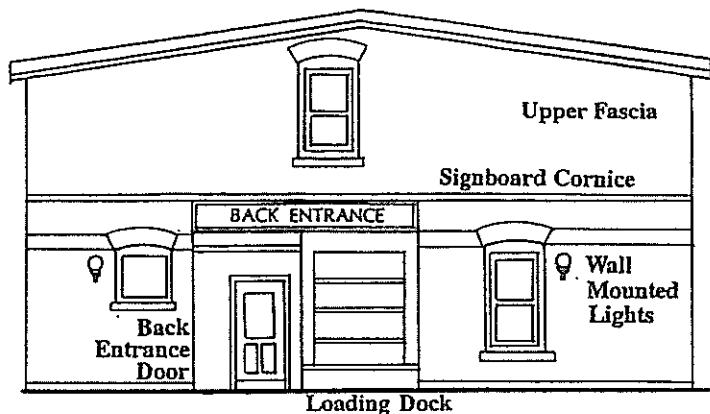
Illustrates a typical rear facade with minor improvements, including a rear entrance
